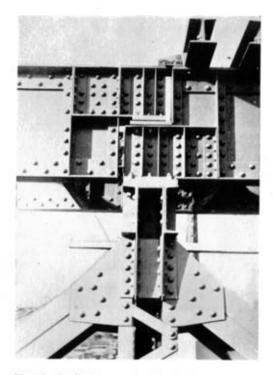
Details of an expansion joint in the stringers over a longitudinally braced trestle of the railway viaduct.
